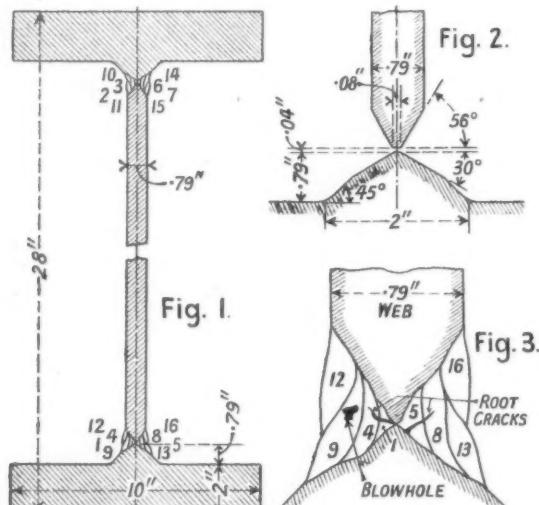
Ribbed-flanged girders No. 1 to 6 : Cross section and welding sequence.
